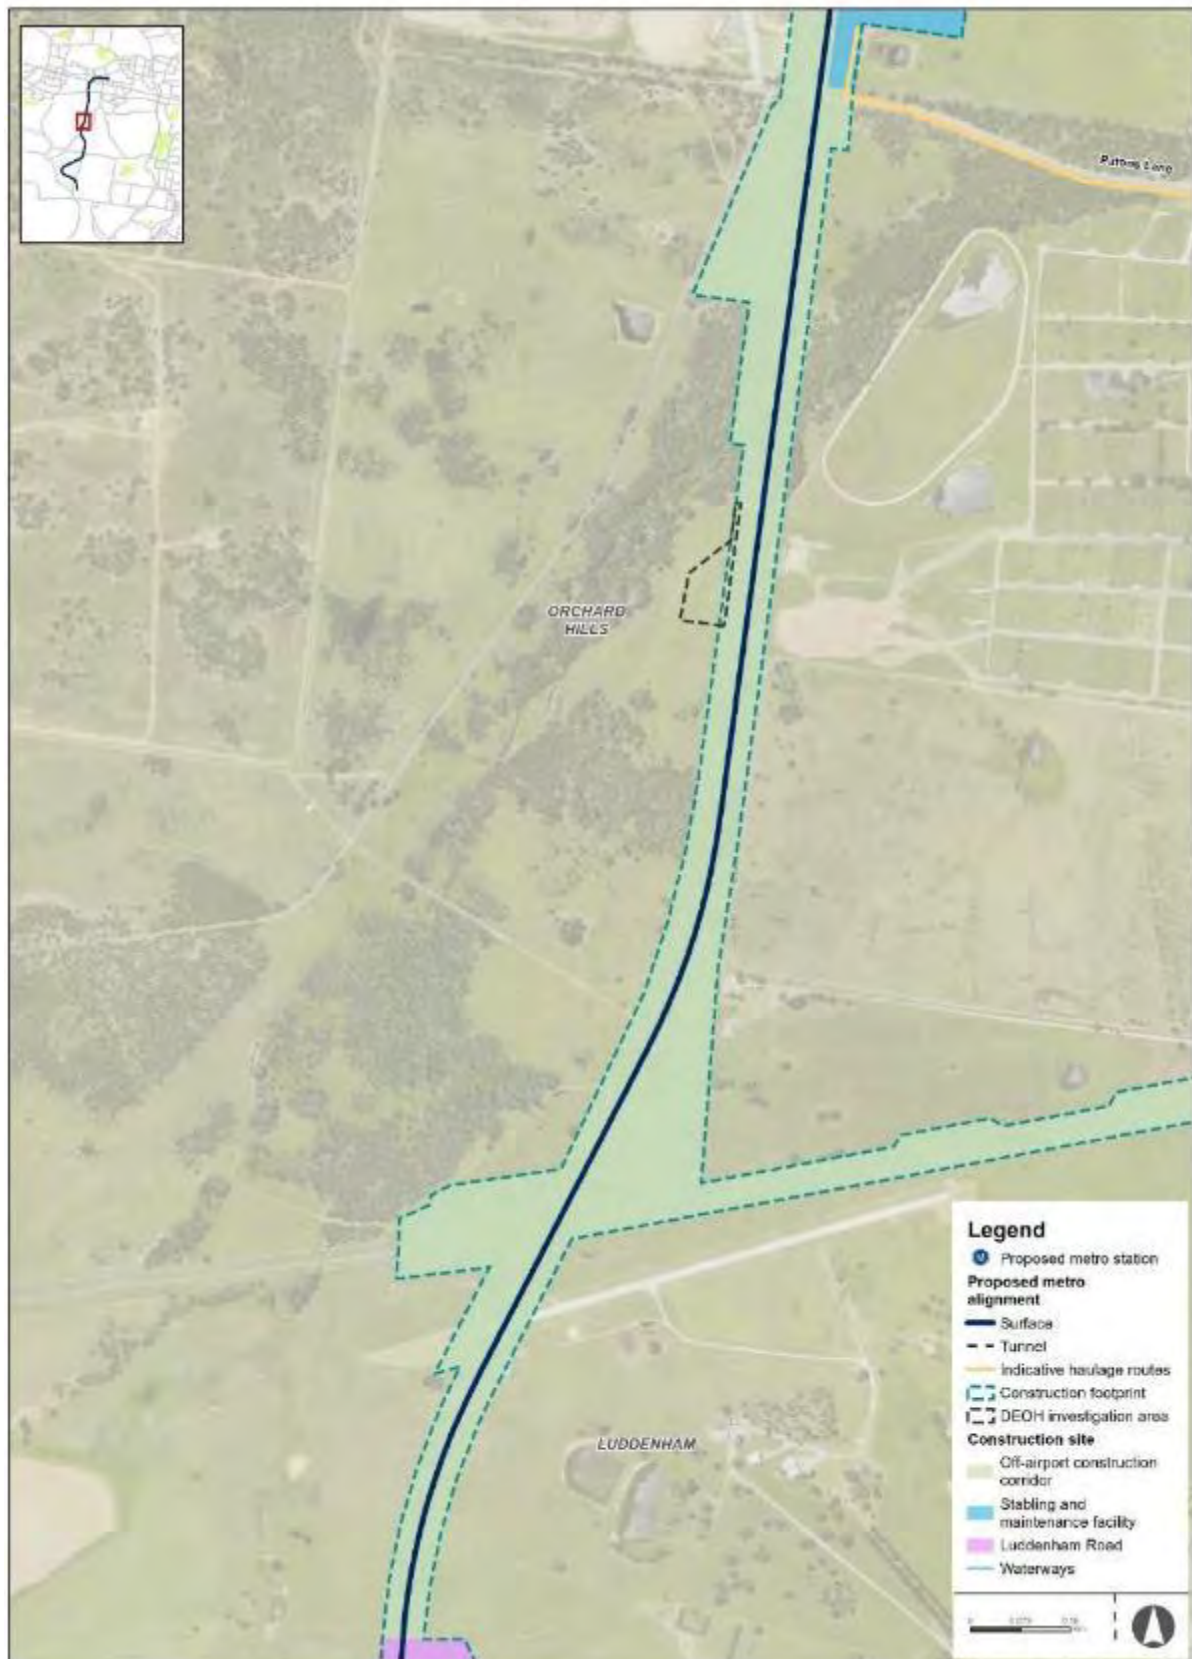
Proposed revised off-airport construction footprint at DEOH lands
